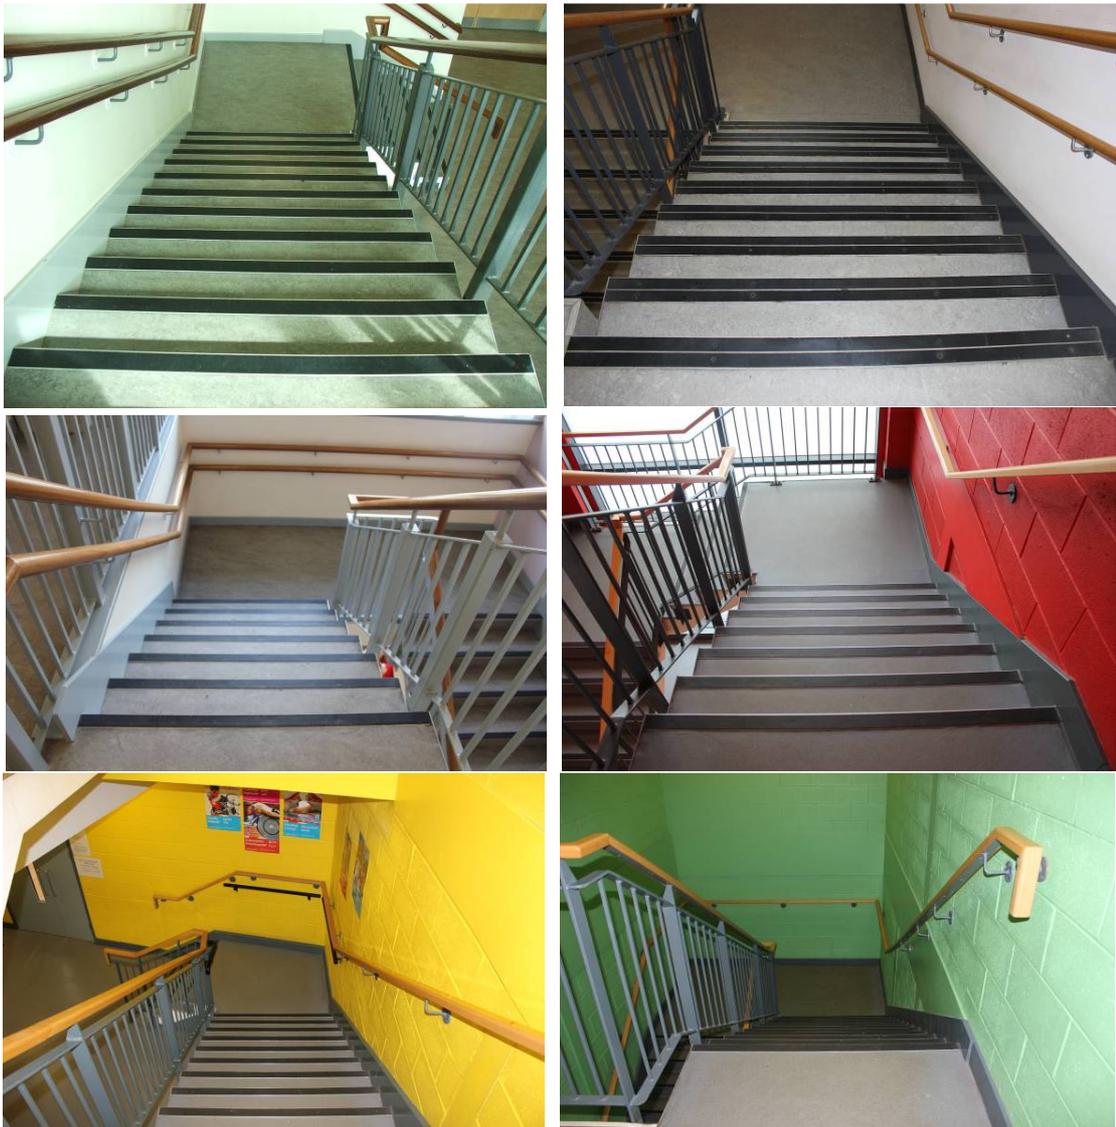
Various colour combinations for floor finish, stair nosing, wall and handrail
